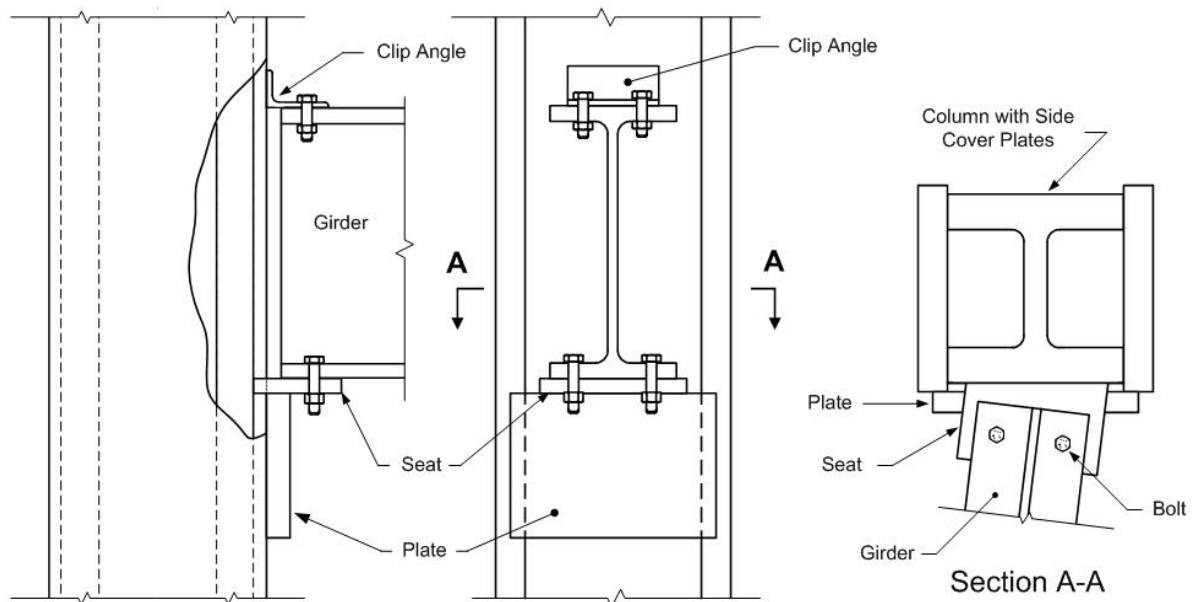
Schematic drawing of the seated connection at Column 79 [2].
